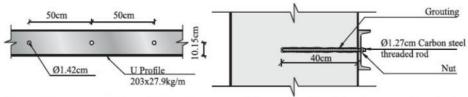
Locations of holes in the fastening system of the masonry U profile and cross section showing
